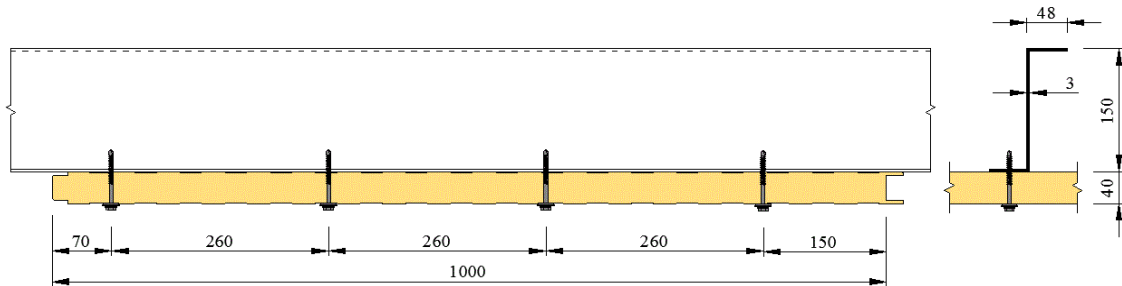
Cross-sections of the purlins and sandwich panels and scheme of the fastening.
